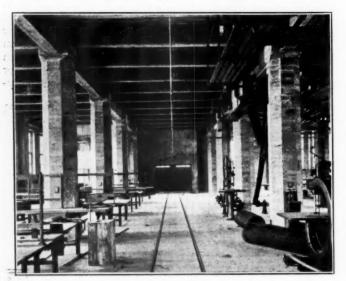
Reinforced Concrete Building Construction for a Pattern Shop
